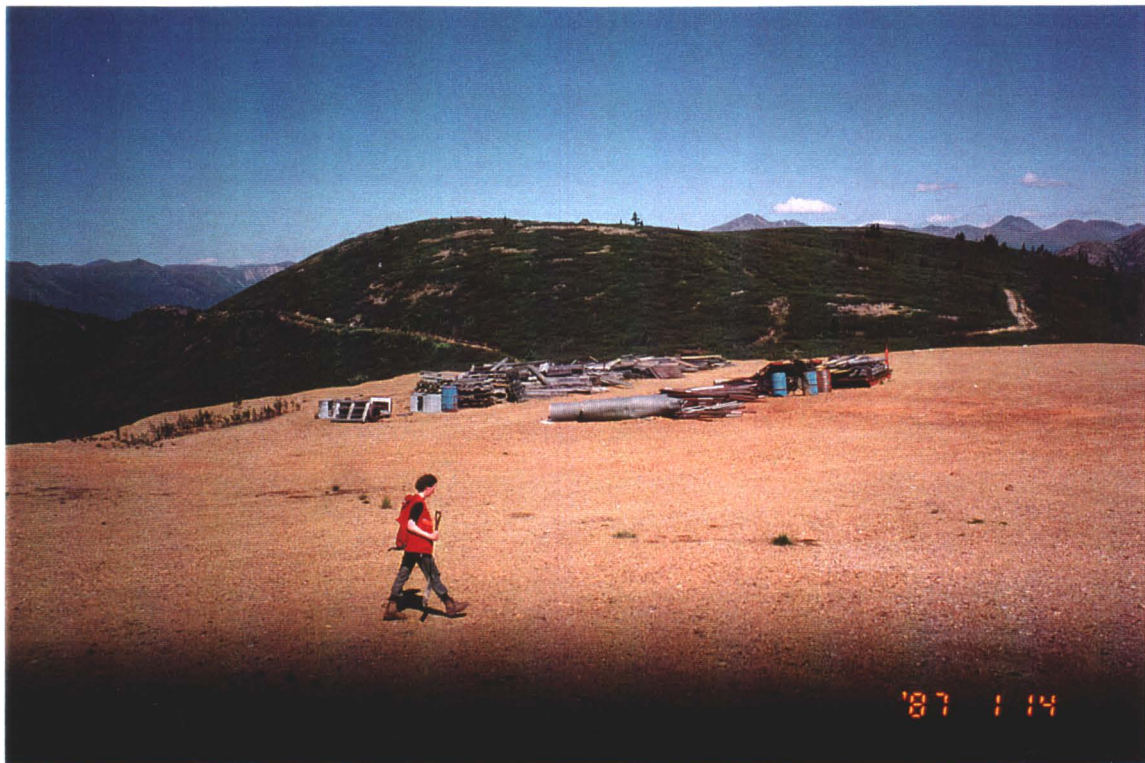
Stacked Materials at Northeast Corner of Equipment Pad
